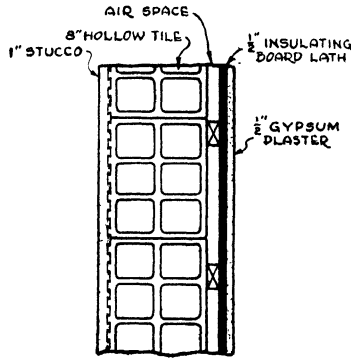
Section through 8-inch Hollow Tile Wall with 1-inch Stucco Exterior Finish and 1/2-inch Gypsum Plaster (on 1/2-inch Insulating Board Lath), Interior Finish
